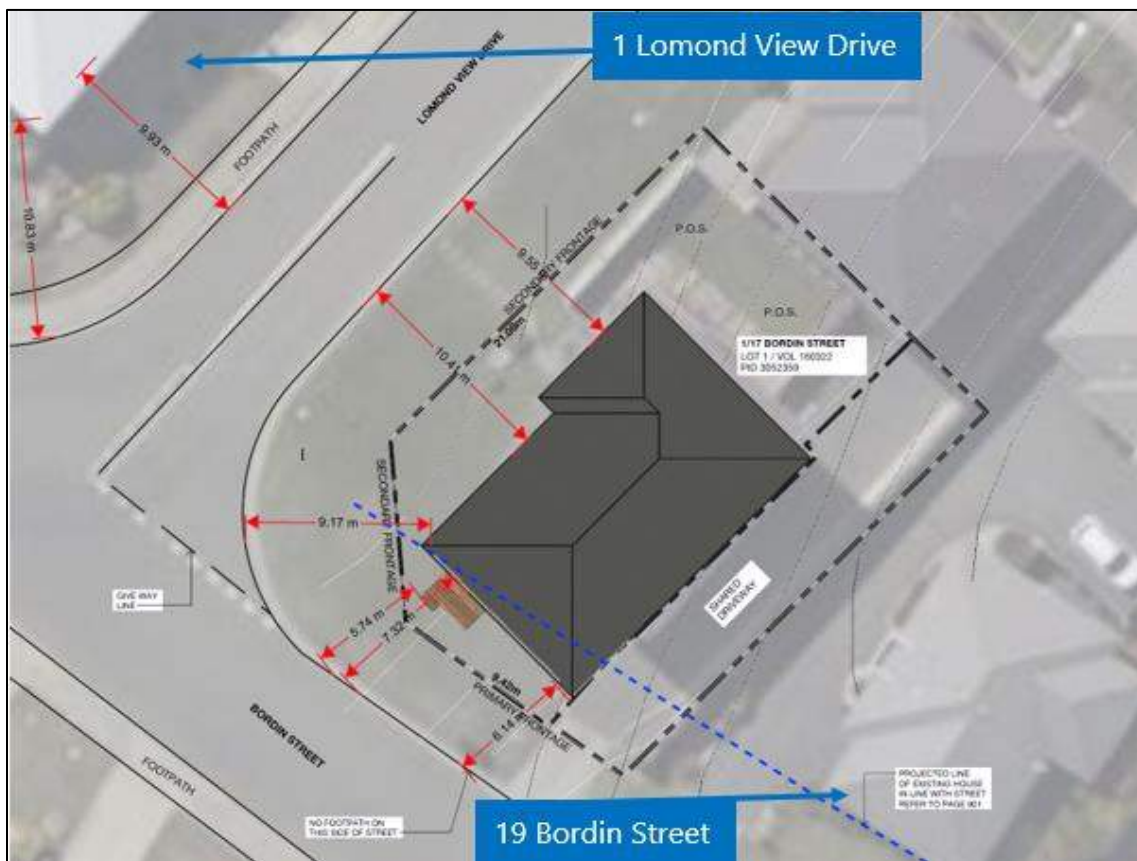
Setbacks to the road carriageway shown for the proposal at 17 Bordin Street and the dwelling at 1 Lomond View Drive.
